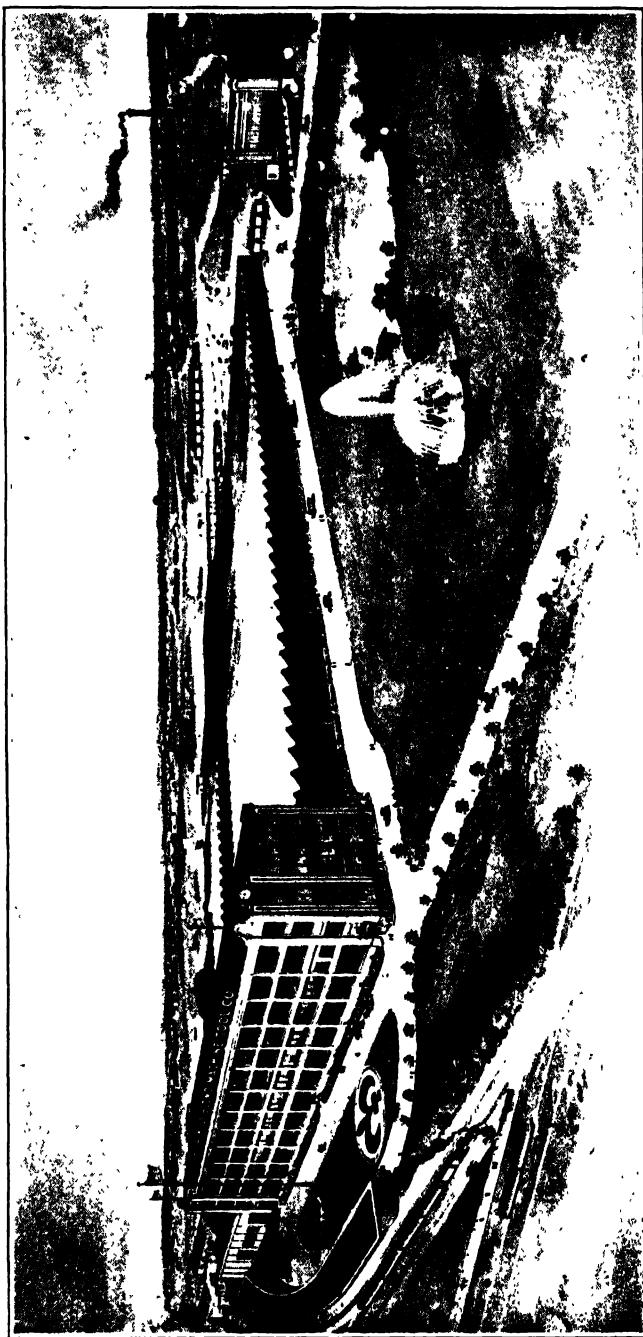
Plant of the R. K. Le Blond Machine Tool Company.
